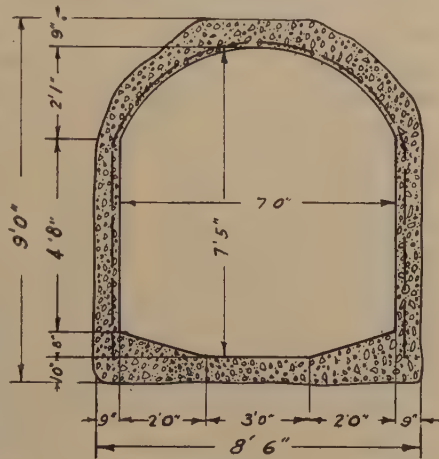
TYPICAL SECTION OF DRAINAGE TUNNEL.
